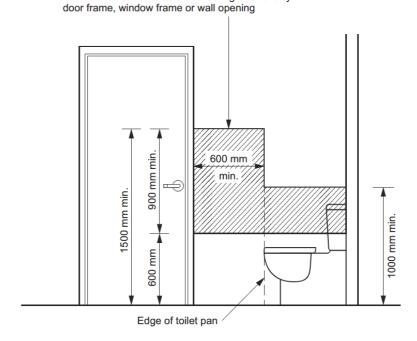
Location of noggings for a wall behind a toilet pan
